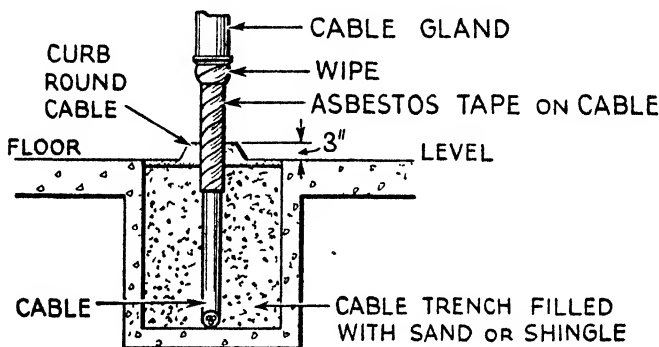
SECTION THROUGH CABLE TRENCH SHOWING FIRE PROTECTION
